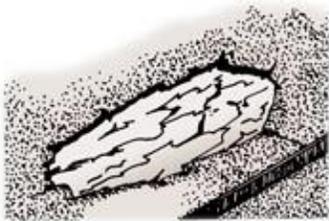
Small holes in concrete can be repaired with latex cement.
